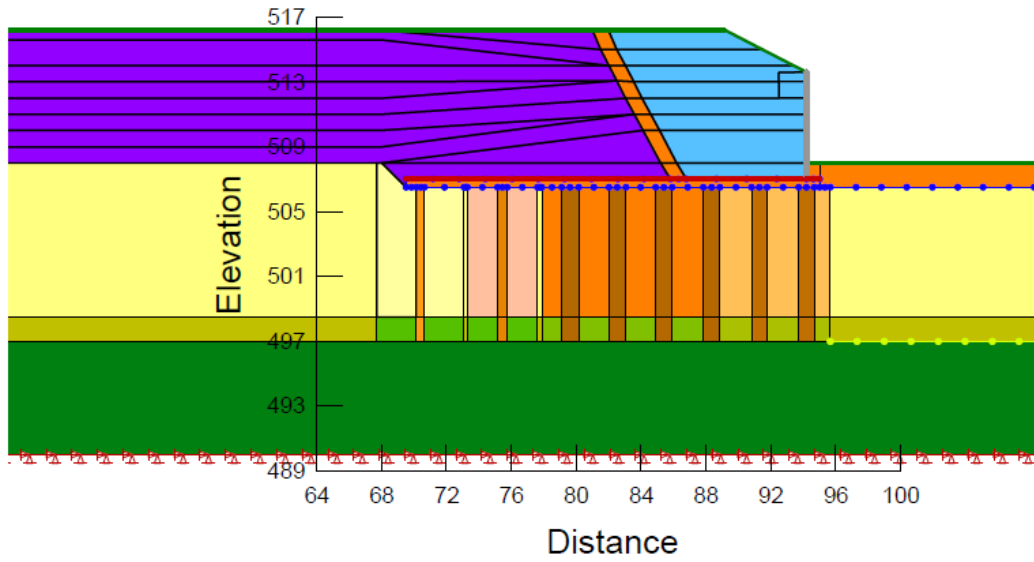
FEM South Abutment Profile Model Completed Stage with Drainage Influenced Soil Zones
